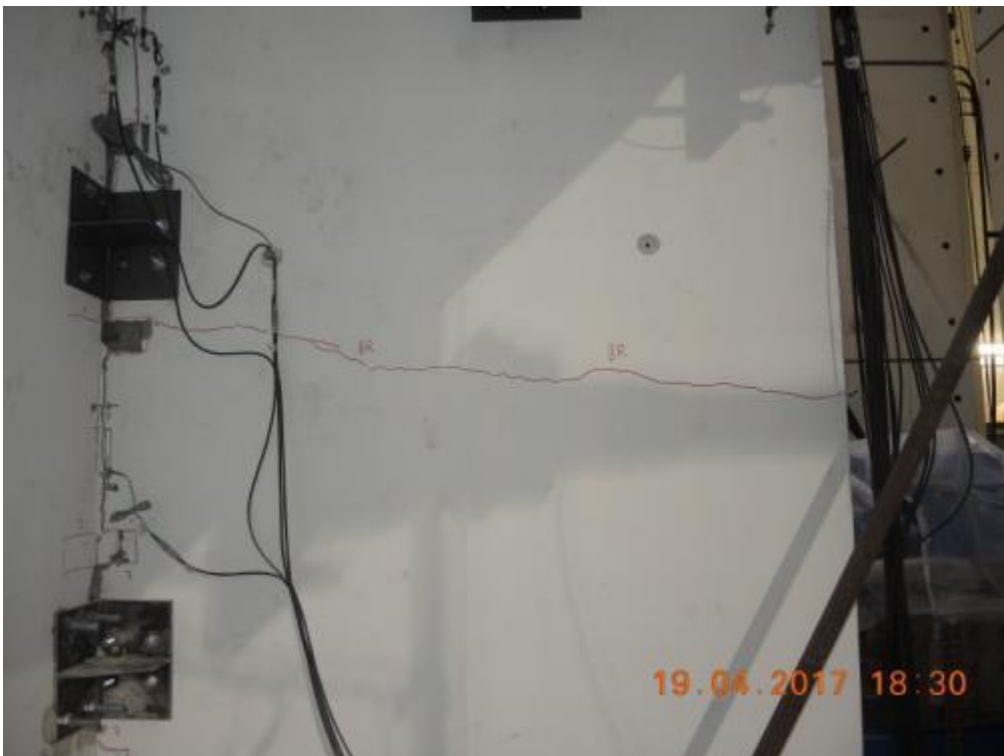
Full-depth/full-width/mid-height horizontal crack in lateral wall W1L2 – West side, North face.
